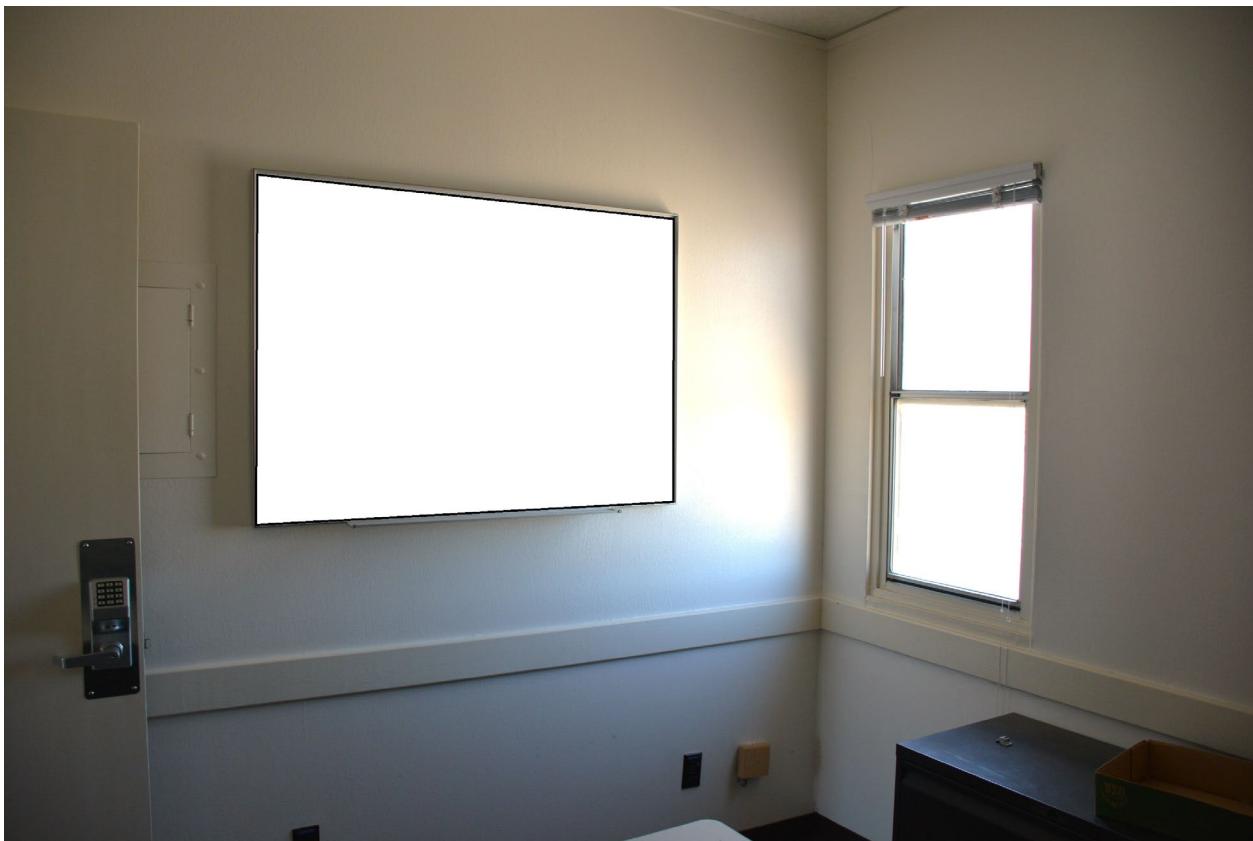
View into office south-central part of the building, facing south/southeast (22110_3950).
